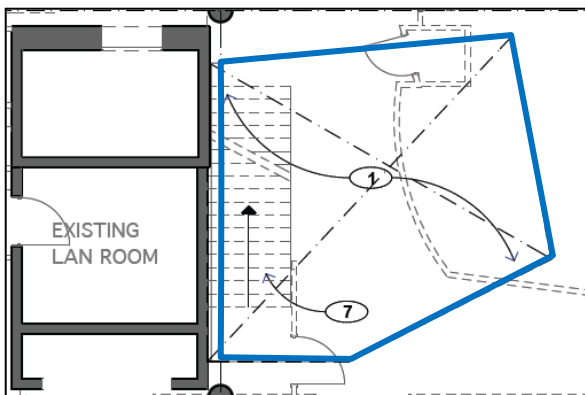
Fourth Floor Slab Demolition Plan, Courtesy of Core Architects
